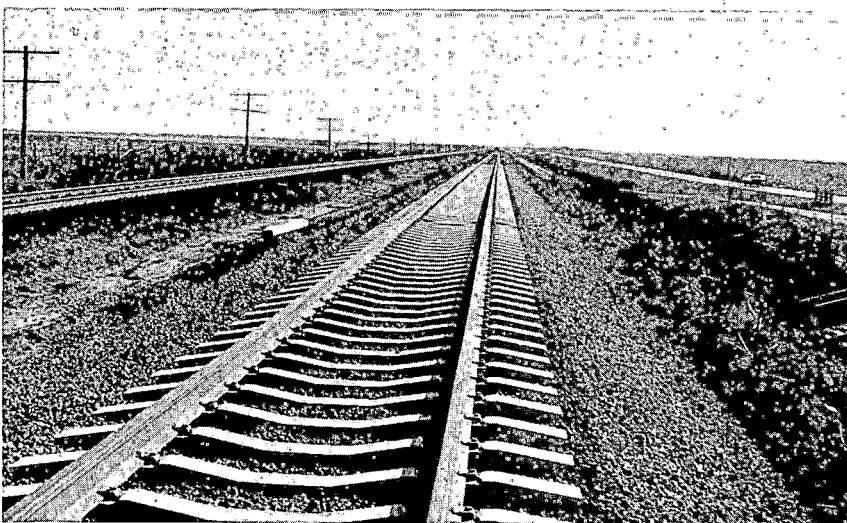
GENERAL VIEW OF CONCRETE TIE SECTION
